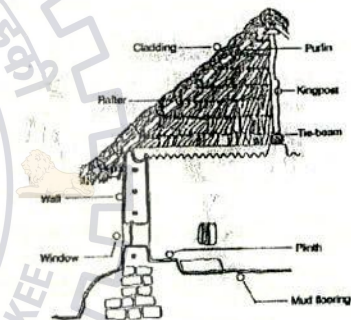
Cross section of an evolved Bhunga house (Source: Apurva Amin, CEPT)
